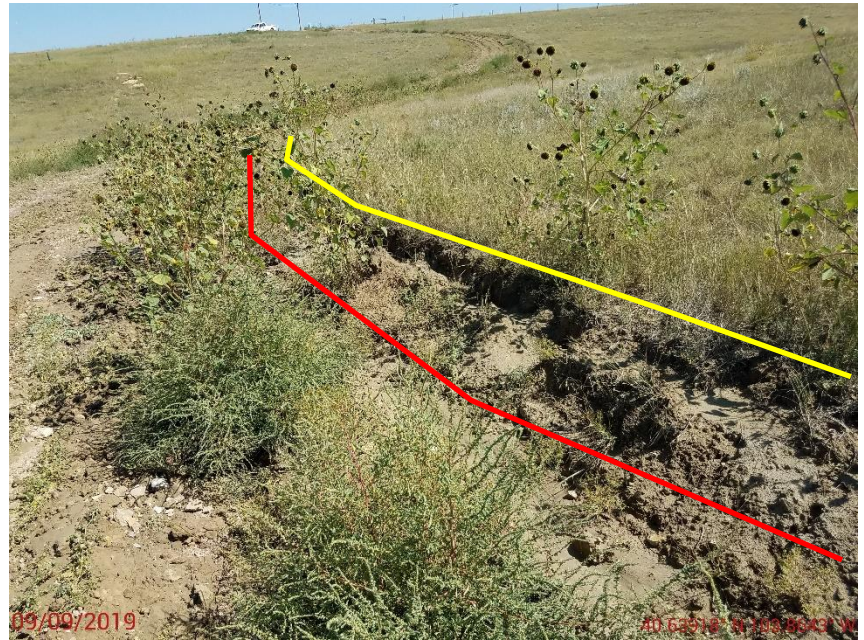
Photo taken from the access road, facing north. Photo shows access road (red) has not been recontoured or graded to that of the adjacent lands (yellow).
